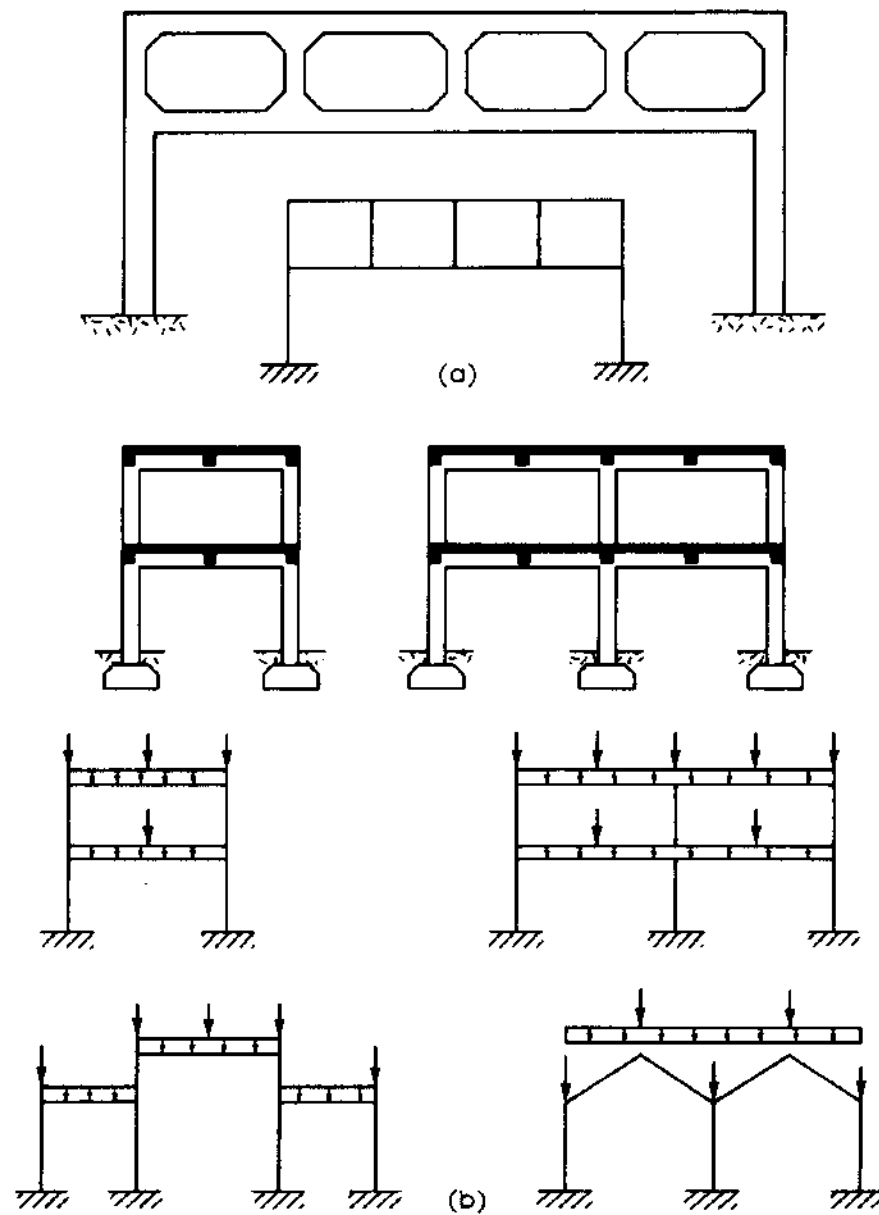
(a) Vierendeel girder and (b) statically indeterminate frames.
